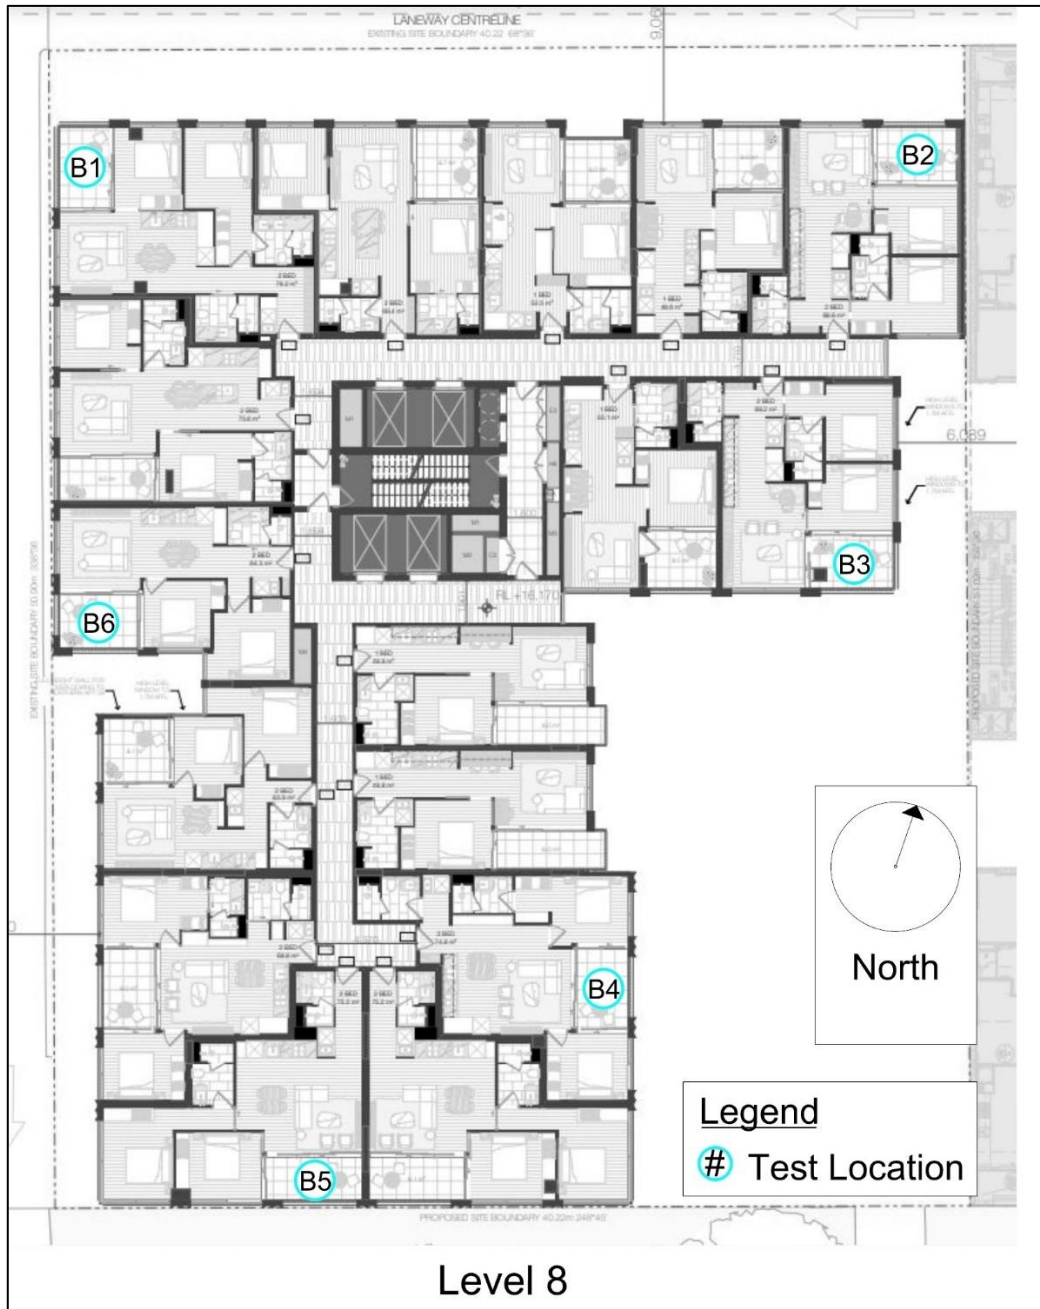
Test Locations on Level 8 of the proposed 60-70 Park Street development.
